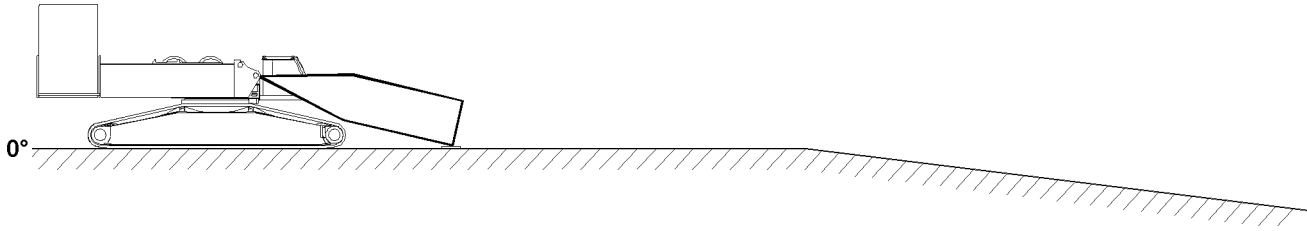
Disassembling and removing the boom - intermediate sections to the boom - pivot section
